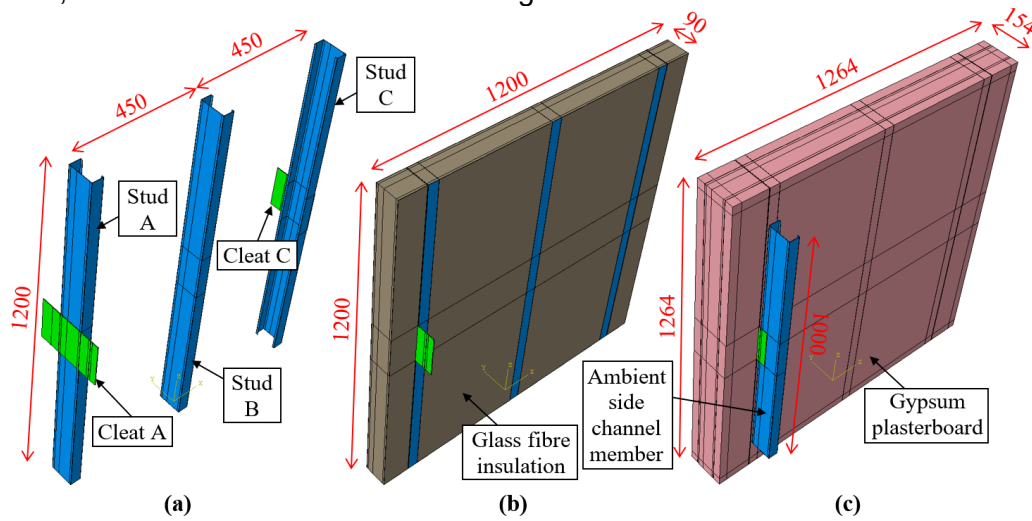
Thermal FE model of the wall specimen with (a) glass fibre insulation and gypsum plasterboards hidden, (b) gypsum plasterboards hidden, and (c) all details.
